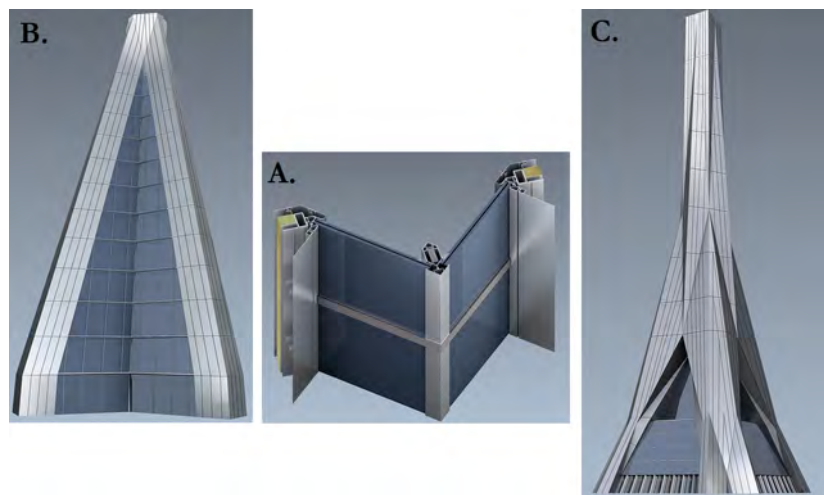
Feature Walls (A. Wall Type 1.2, B. Wall Type 2.2, C. Wall Type 7)
